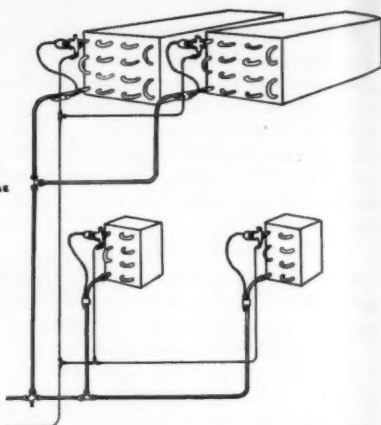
METHOD OF CONNECTING COILS FOR WALK IN BOX AND END BUNKER DISPLAY CASE SHOWING PROPER LOCATION OF EXPANSION VALVES
